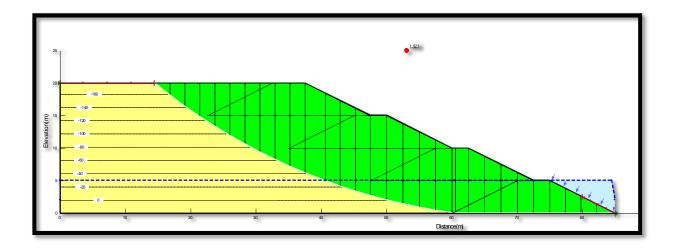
Embankment cross section for 1:2 slope at 5 m water level
